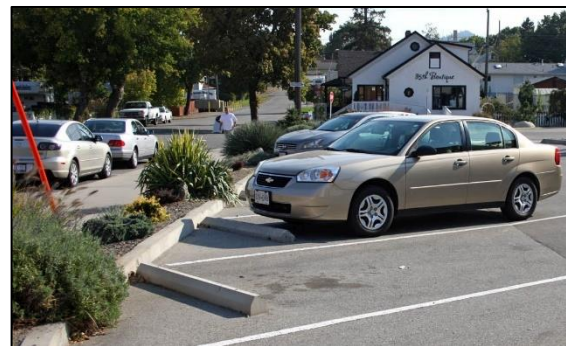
Planting strip between a parking lot and the sidewalk.⁵
